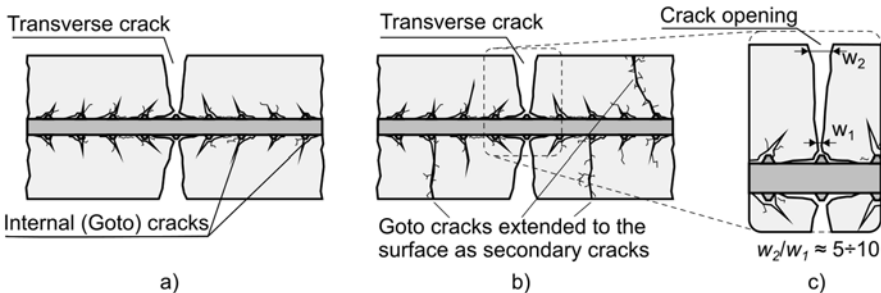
Reinforced concrete cracking phenomena: a) secondary cracks, often call Goto cracks, localised around bar ribs, b) as secondary cracks reaching the surface of an element, c) crack width increase further away from the bar.
